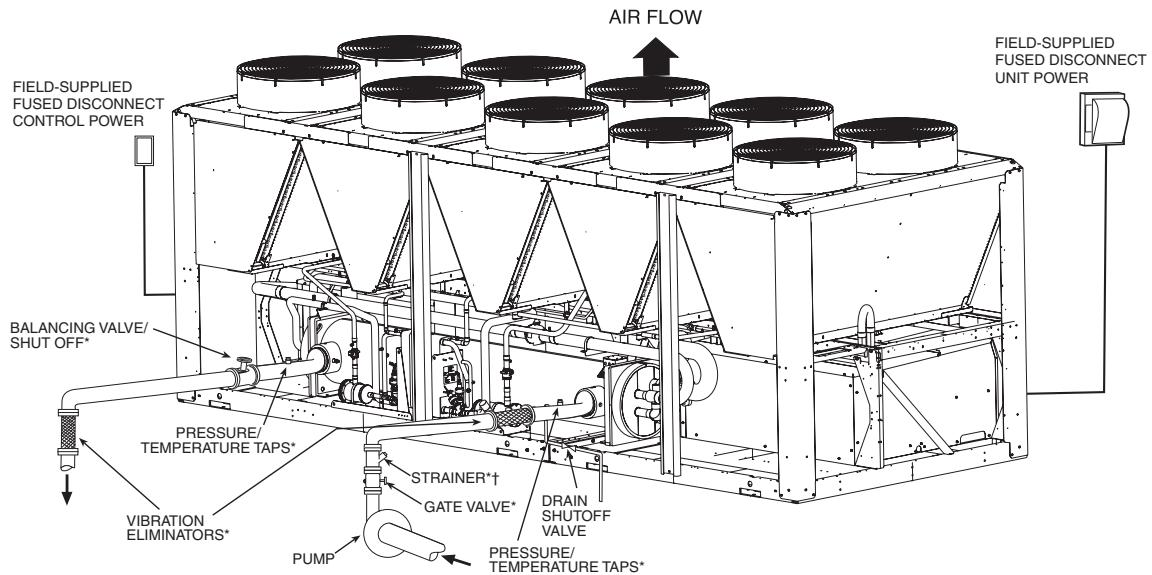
30XA Flooded Cooler Typical Piping and Wiring
